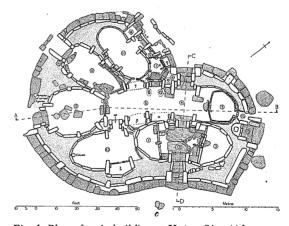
Plan of main building at Hagar Qim. (After Evans, 1971)
